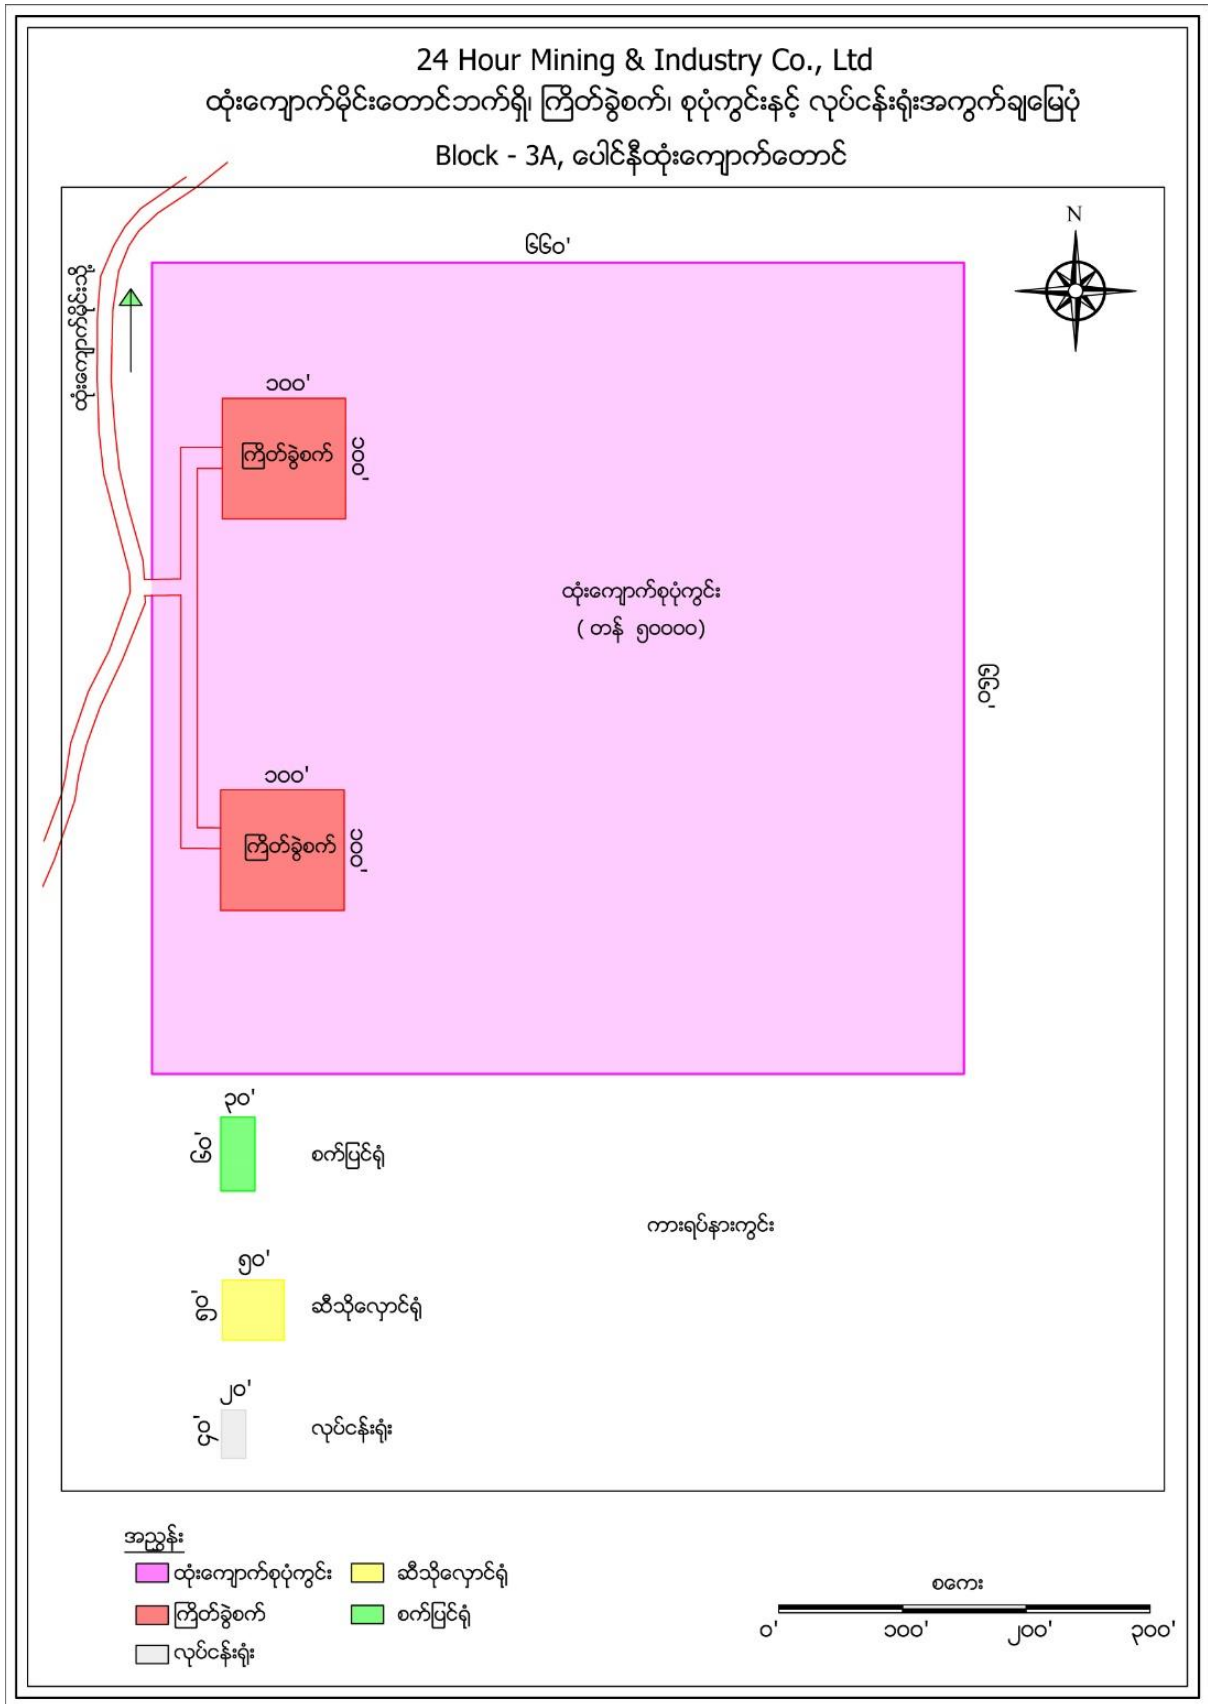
Site Layout Plan of Project Facilities at Quarry Site
